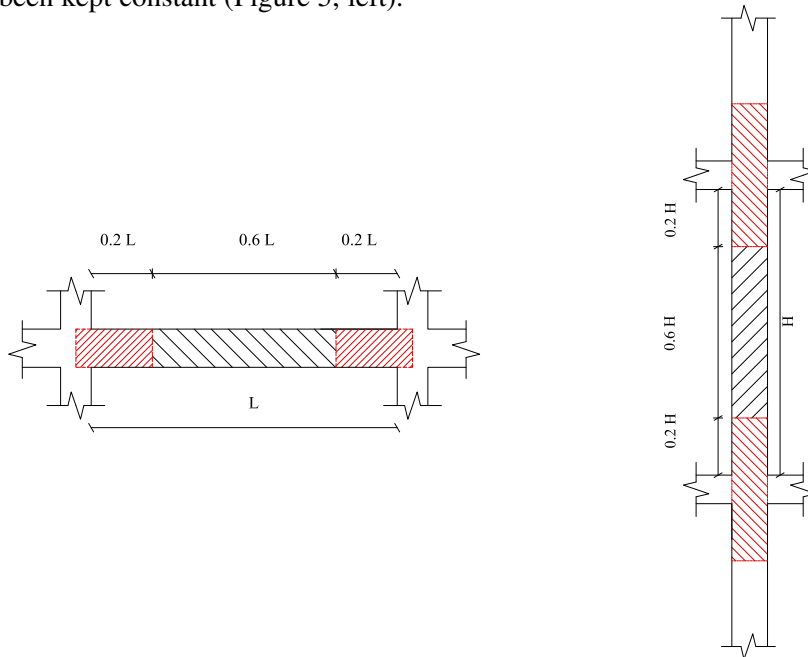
Parts of a beam (left) and a pillar (right) in which the steel reinforcement has been kept constant.
